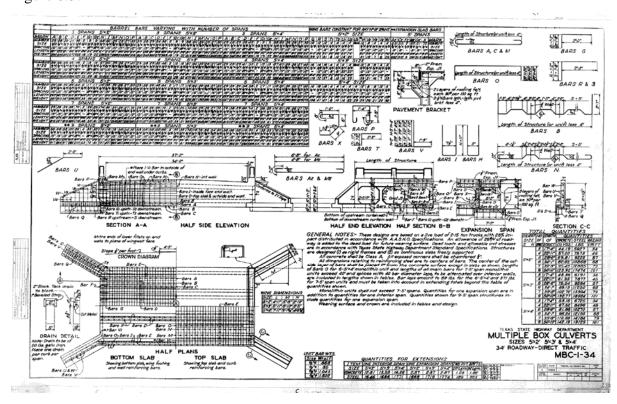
Examples of MBC-#-# design standards family: MBC-1-34
